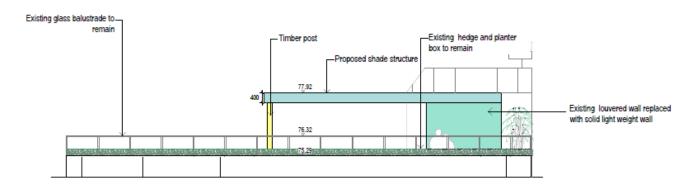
Elevation AA - Northern elevation of pergola and new wall to bathroom.
